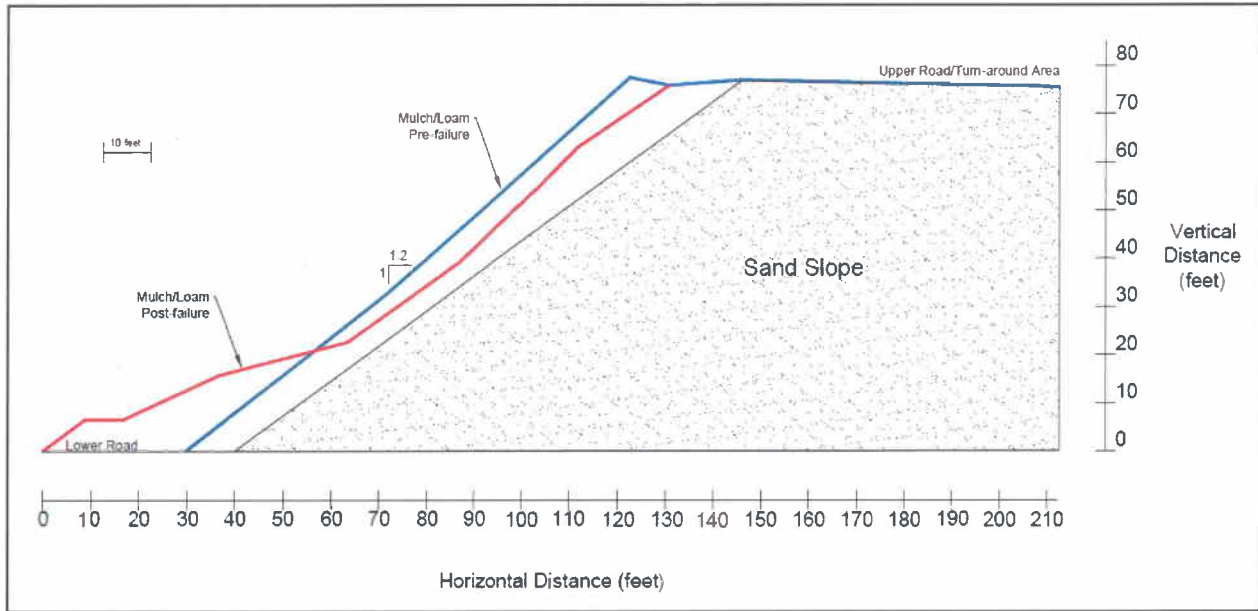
Typical cross-sections for the slope conditions prior to and post failure.
